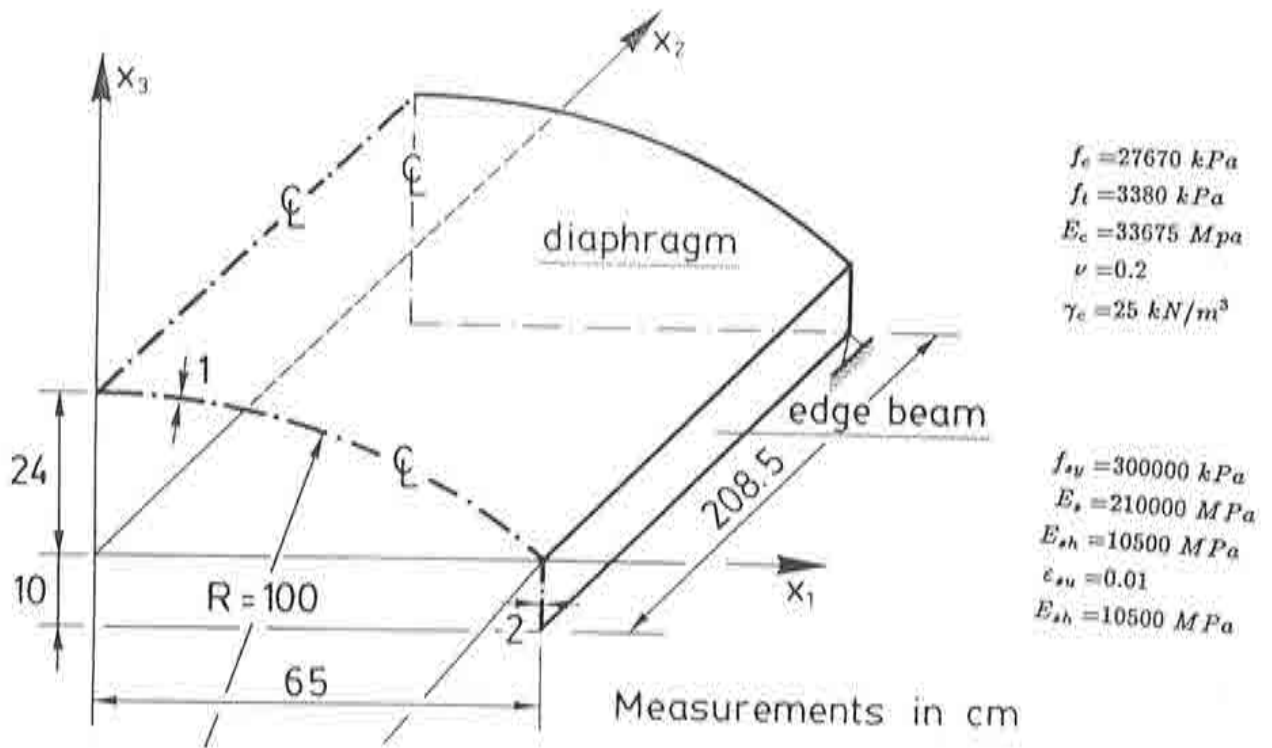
Cylindrical prestressed concrete shell. Geometry and reinforcement distribution.
